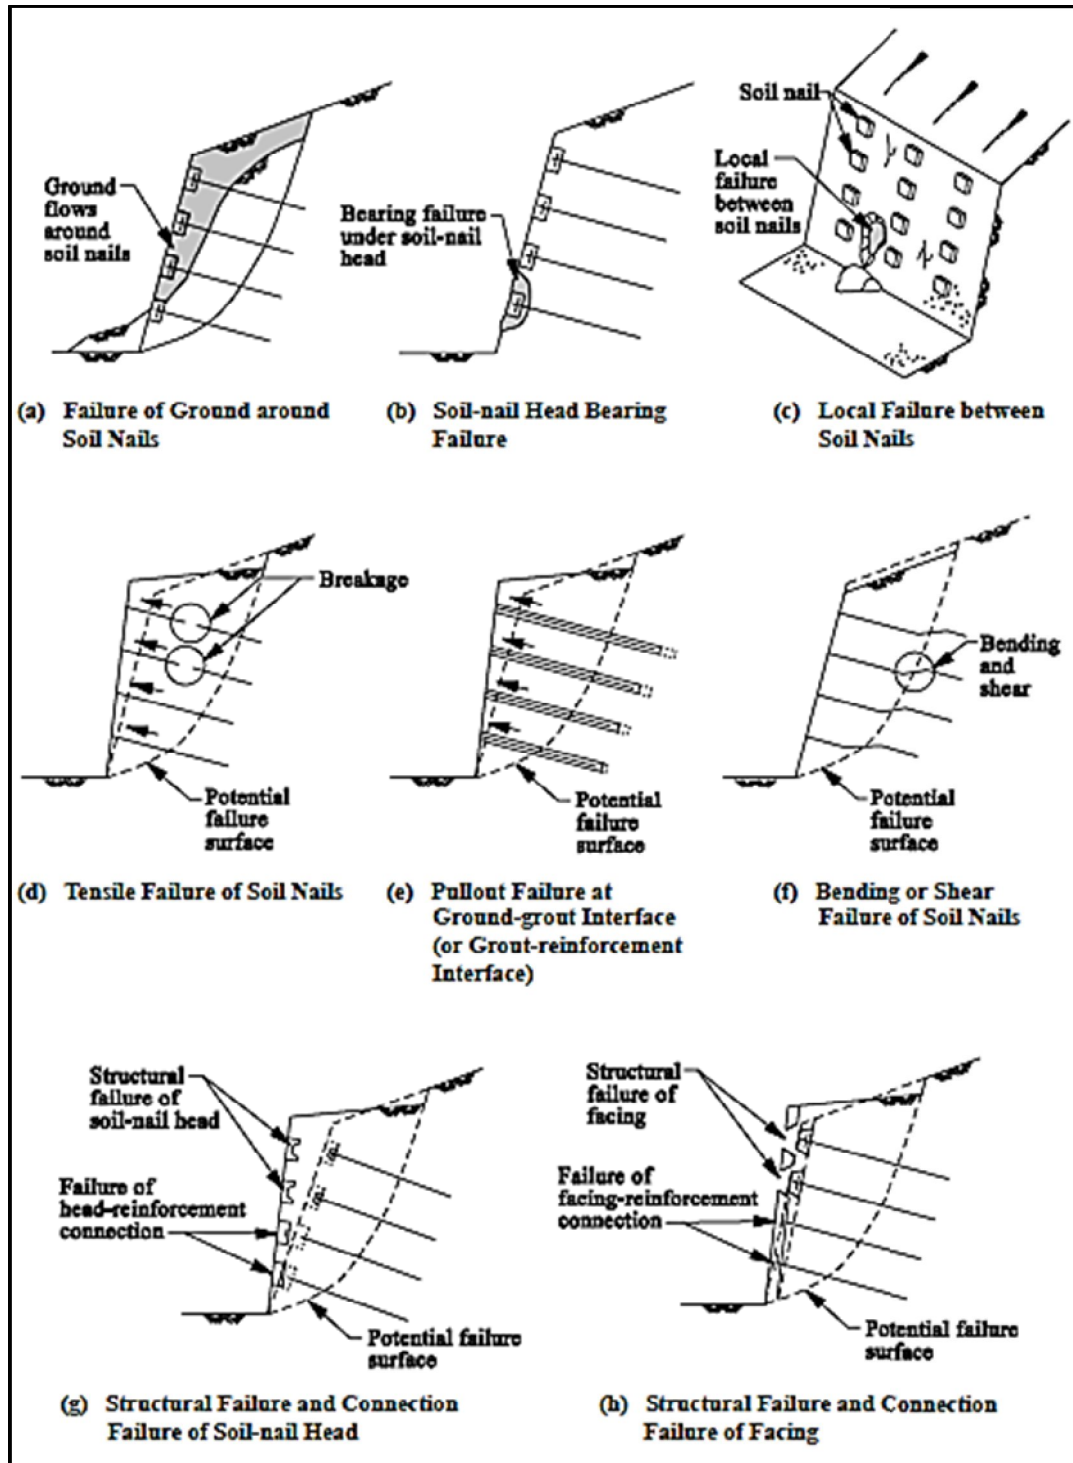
Potential Internal Failure Modes of a Soil Nail System
